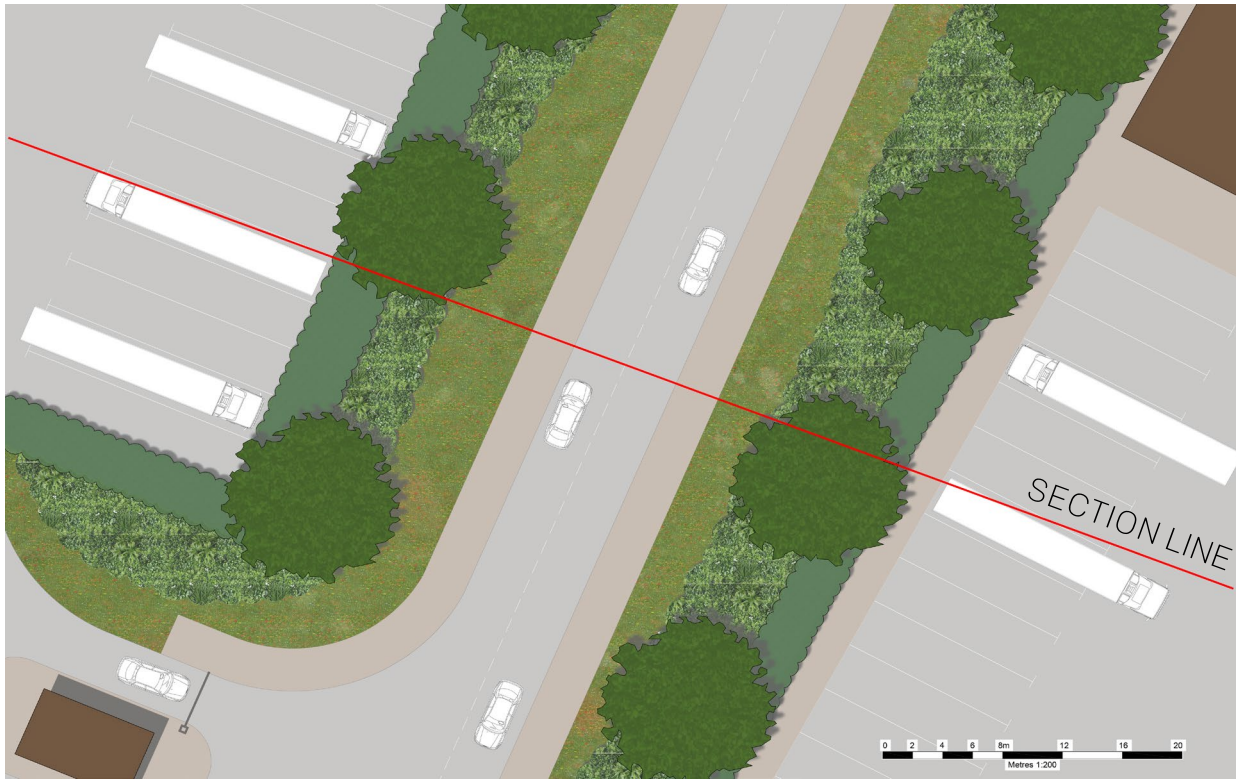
Illustrative Site Extract- Typical Section Through Site Road
